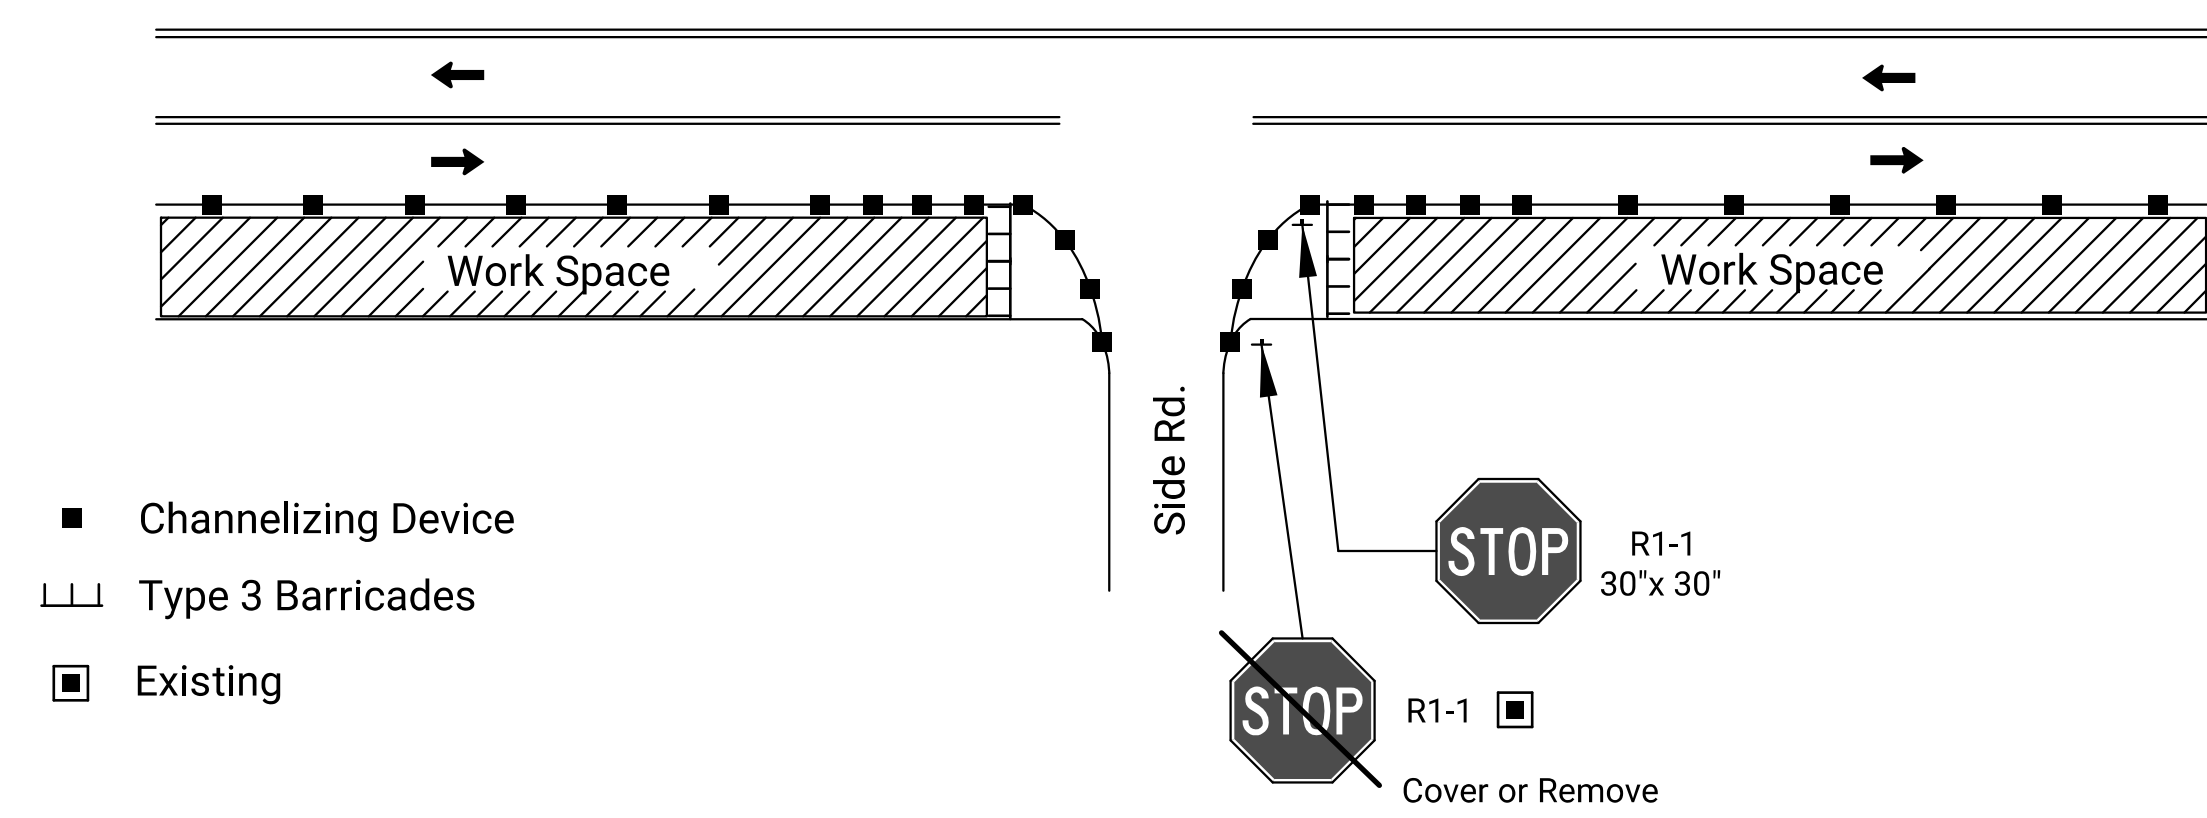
SIDE ROAD OR ENTRANCE OPEN THROUGH WORK AREA
